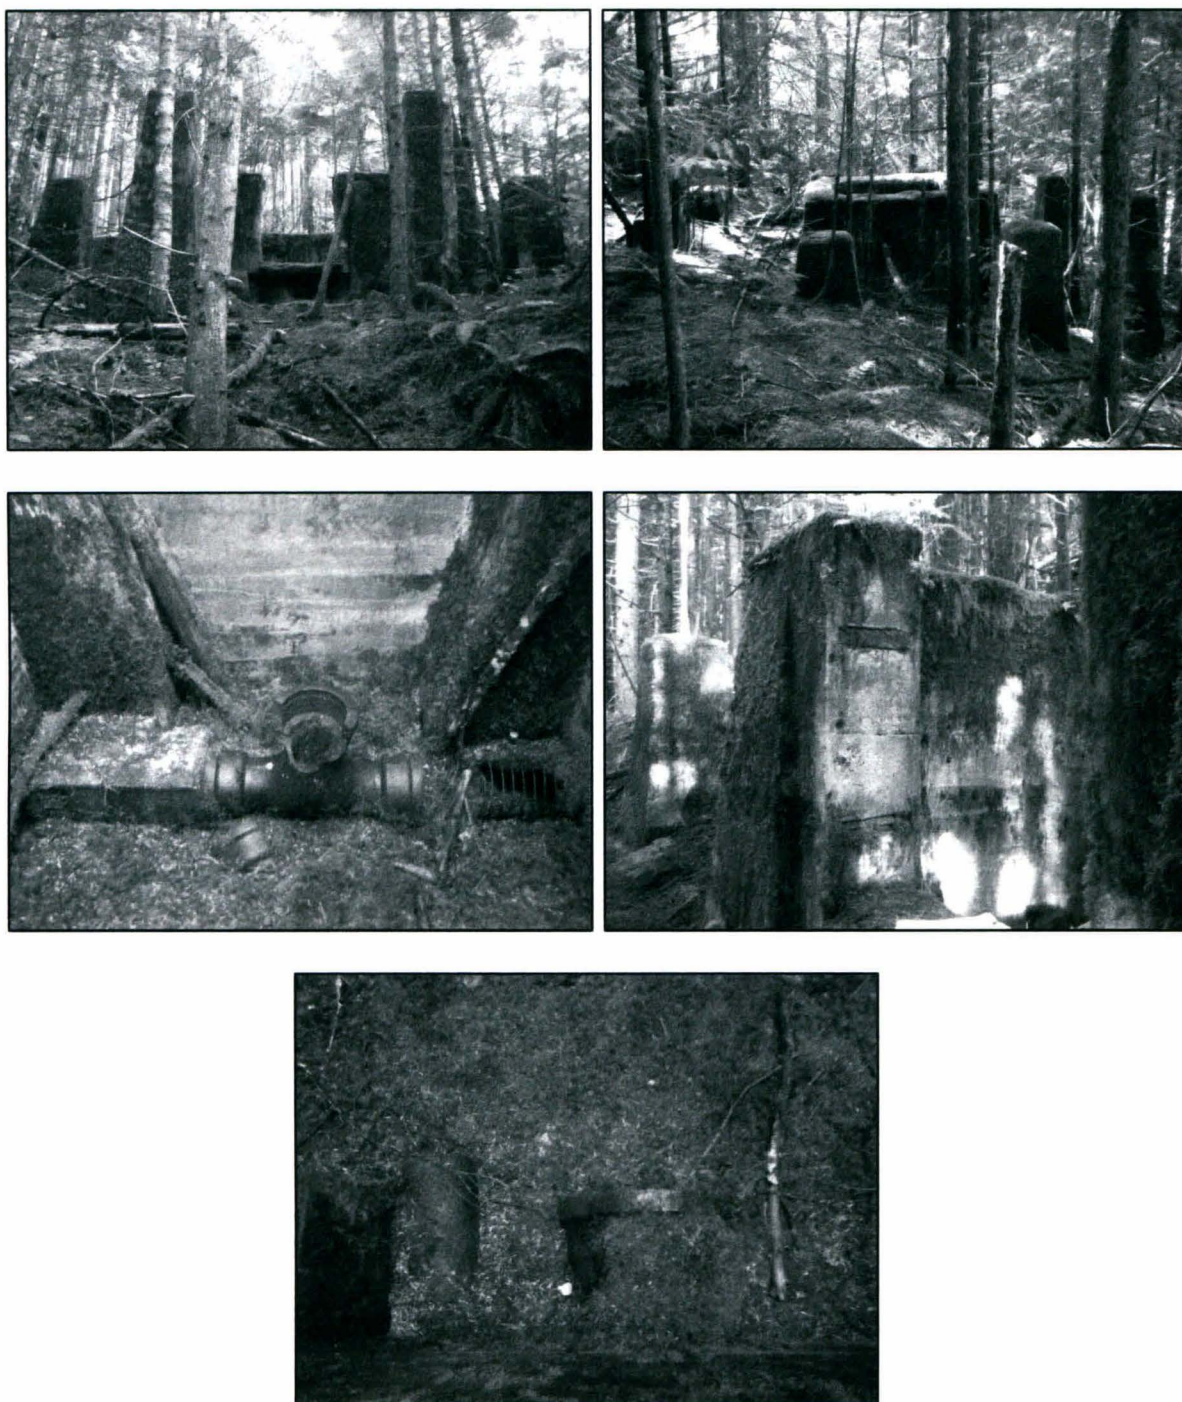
Four views of Feature 1 (watertower foundation). Top left: overview of watertower looking south. Top right: overview of watertower looking west. Bottom left: valve remnants located within the watertower structure on south wall. Bottom right: overview of the slats in the north wall of water tower structure. Bottom center: overview of valve remnants located in the water tower structure on the ground adjacent to the north wall.
